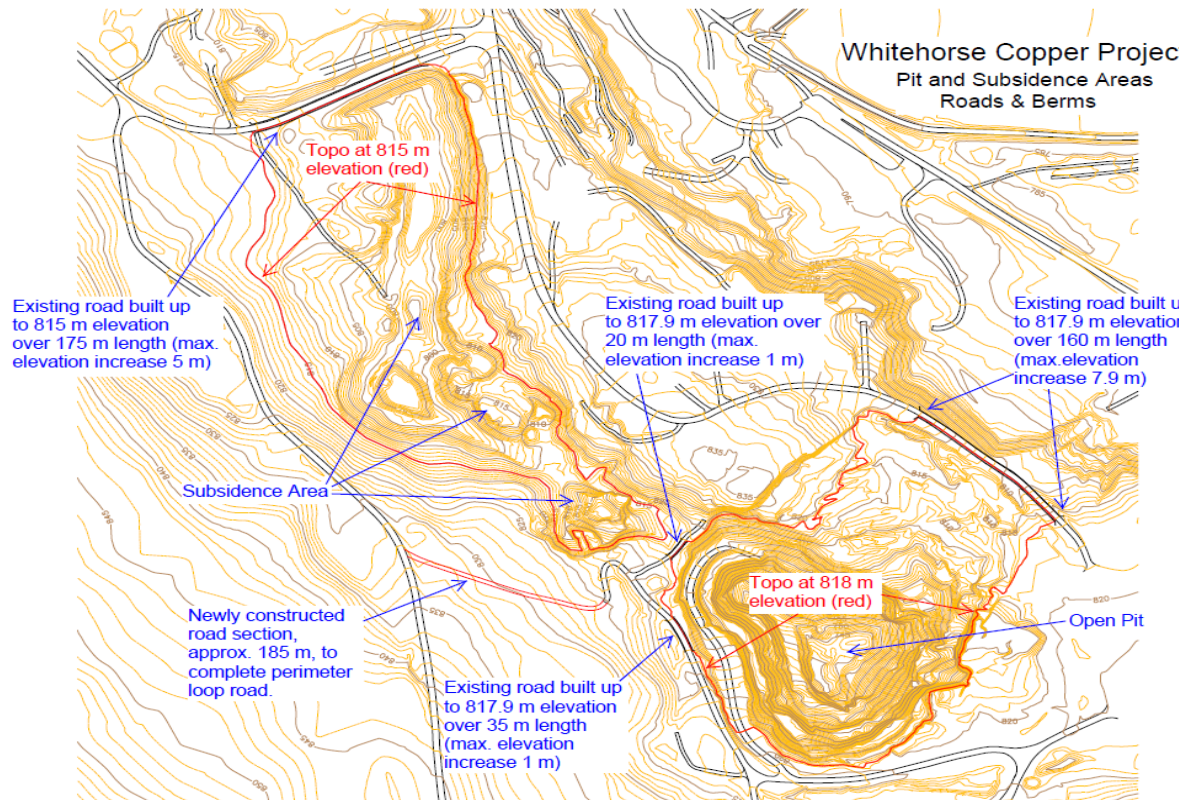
Whitehorse Copper Pit and Subsidence Areas Roads & Berms
